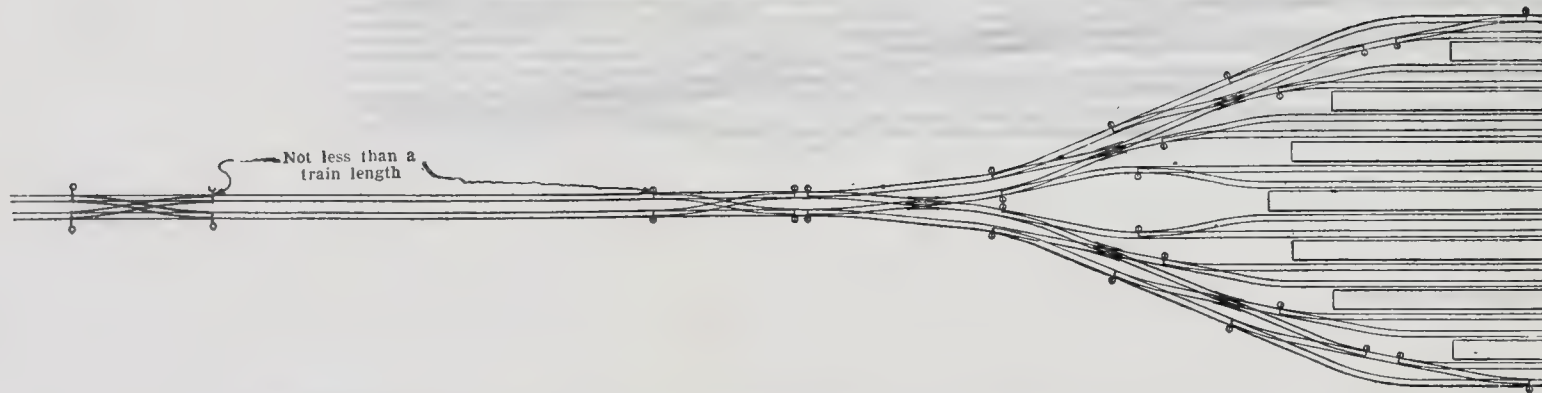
TYPICAL TRACK LAYOUT AT THROUGH PASSENGER TERMINAL STATION.
